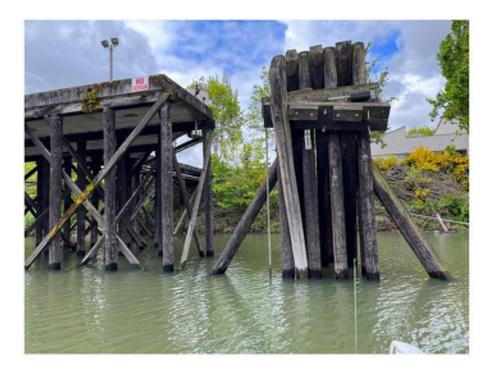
Lay Berth 308 Dolphin Dolphin D11 Broken piles at Dolphin D11 Moata ID: Not Applicable
